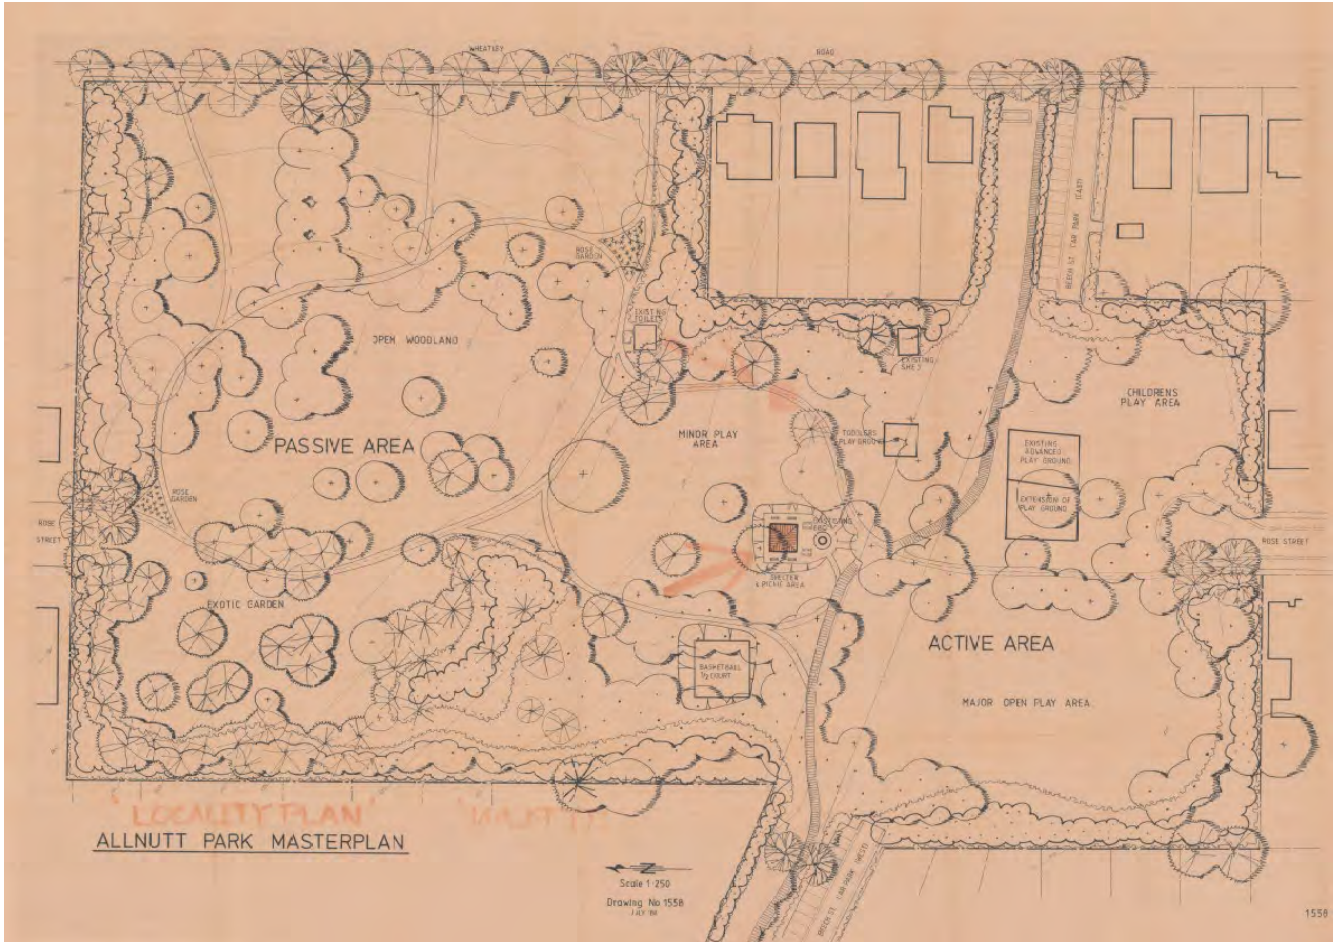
Allnutt Park Masterplan, c1990. North is left (Source: Permit plans provided by Glen Eira City Council).
